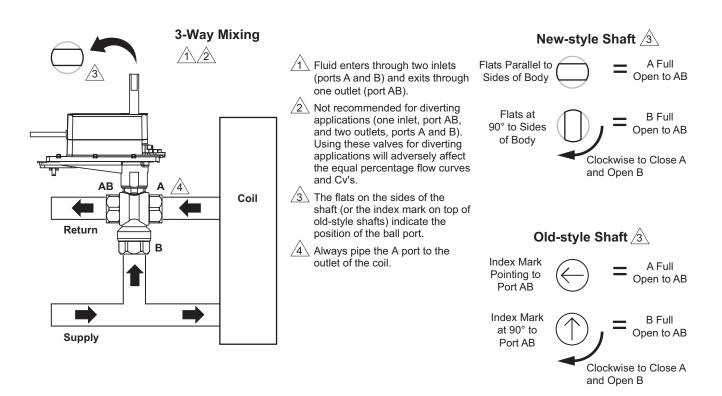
3-Way Mixing Valve Assemblies Piping Diagram.
